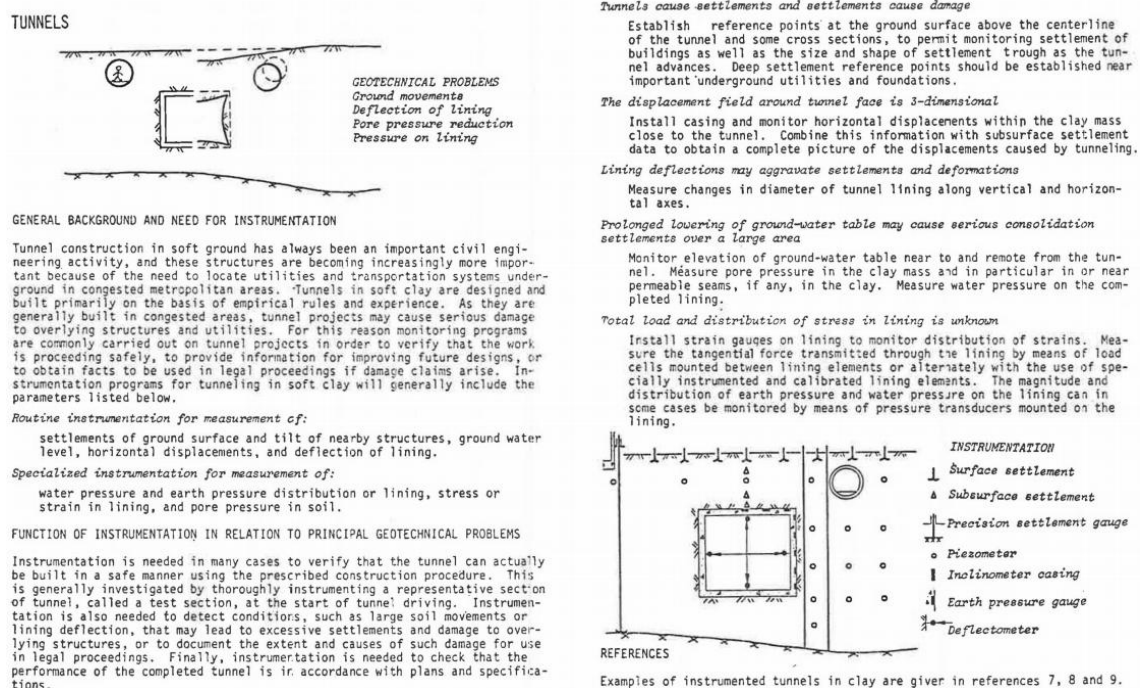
Need for instrumentation regarding tunnel structures (from [13])
